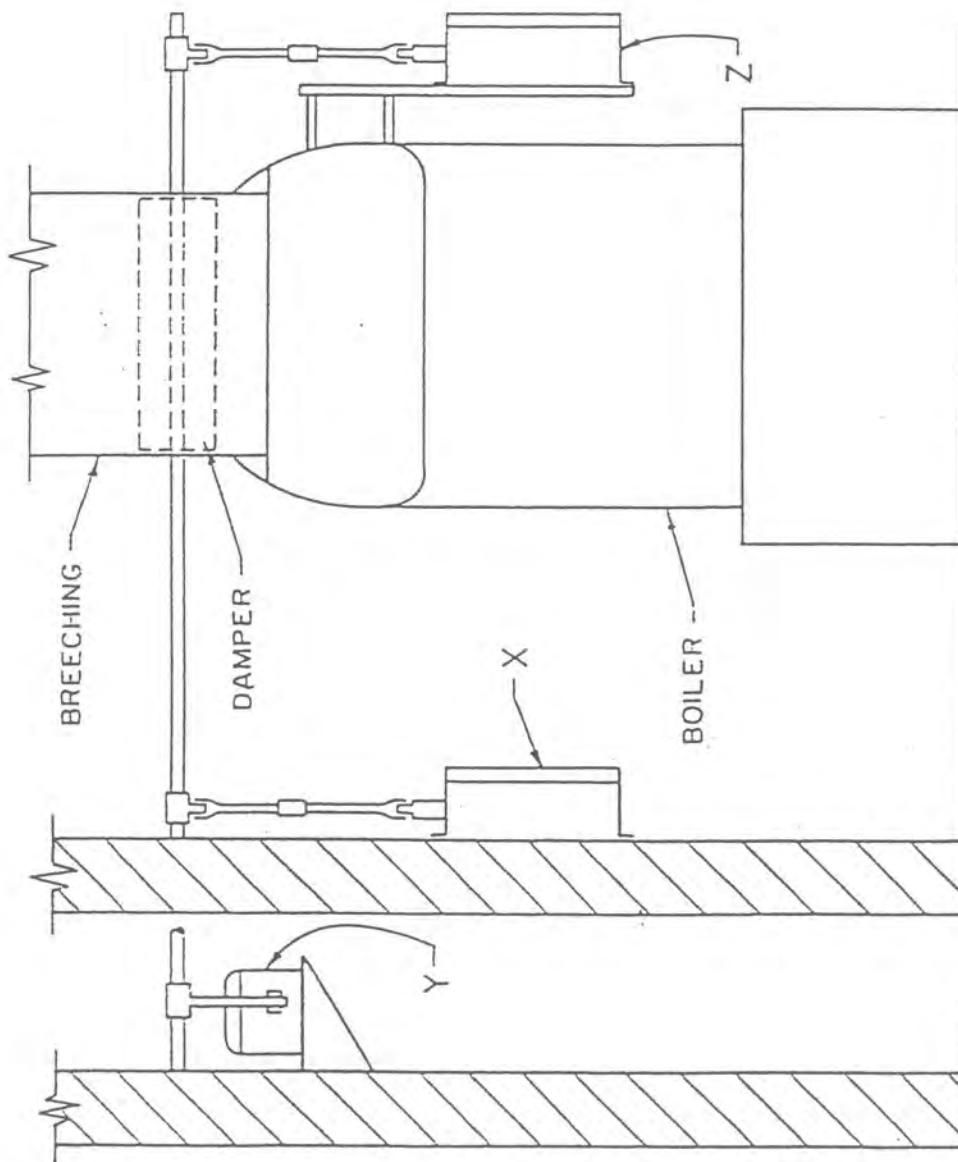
SUGGESTED MOUNTING LOCATIONS
